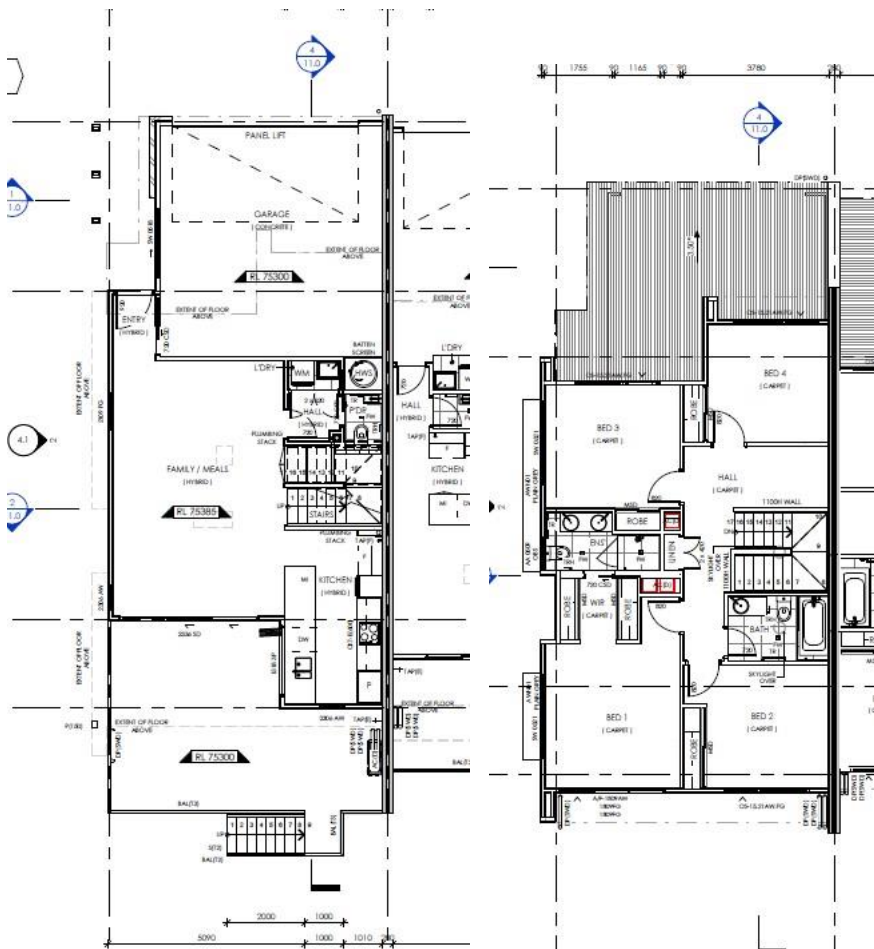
Townhouse (Mid and End) Ground Floor (left) and First Floor (right)
